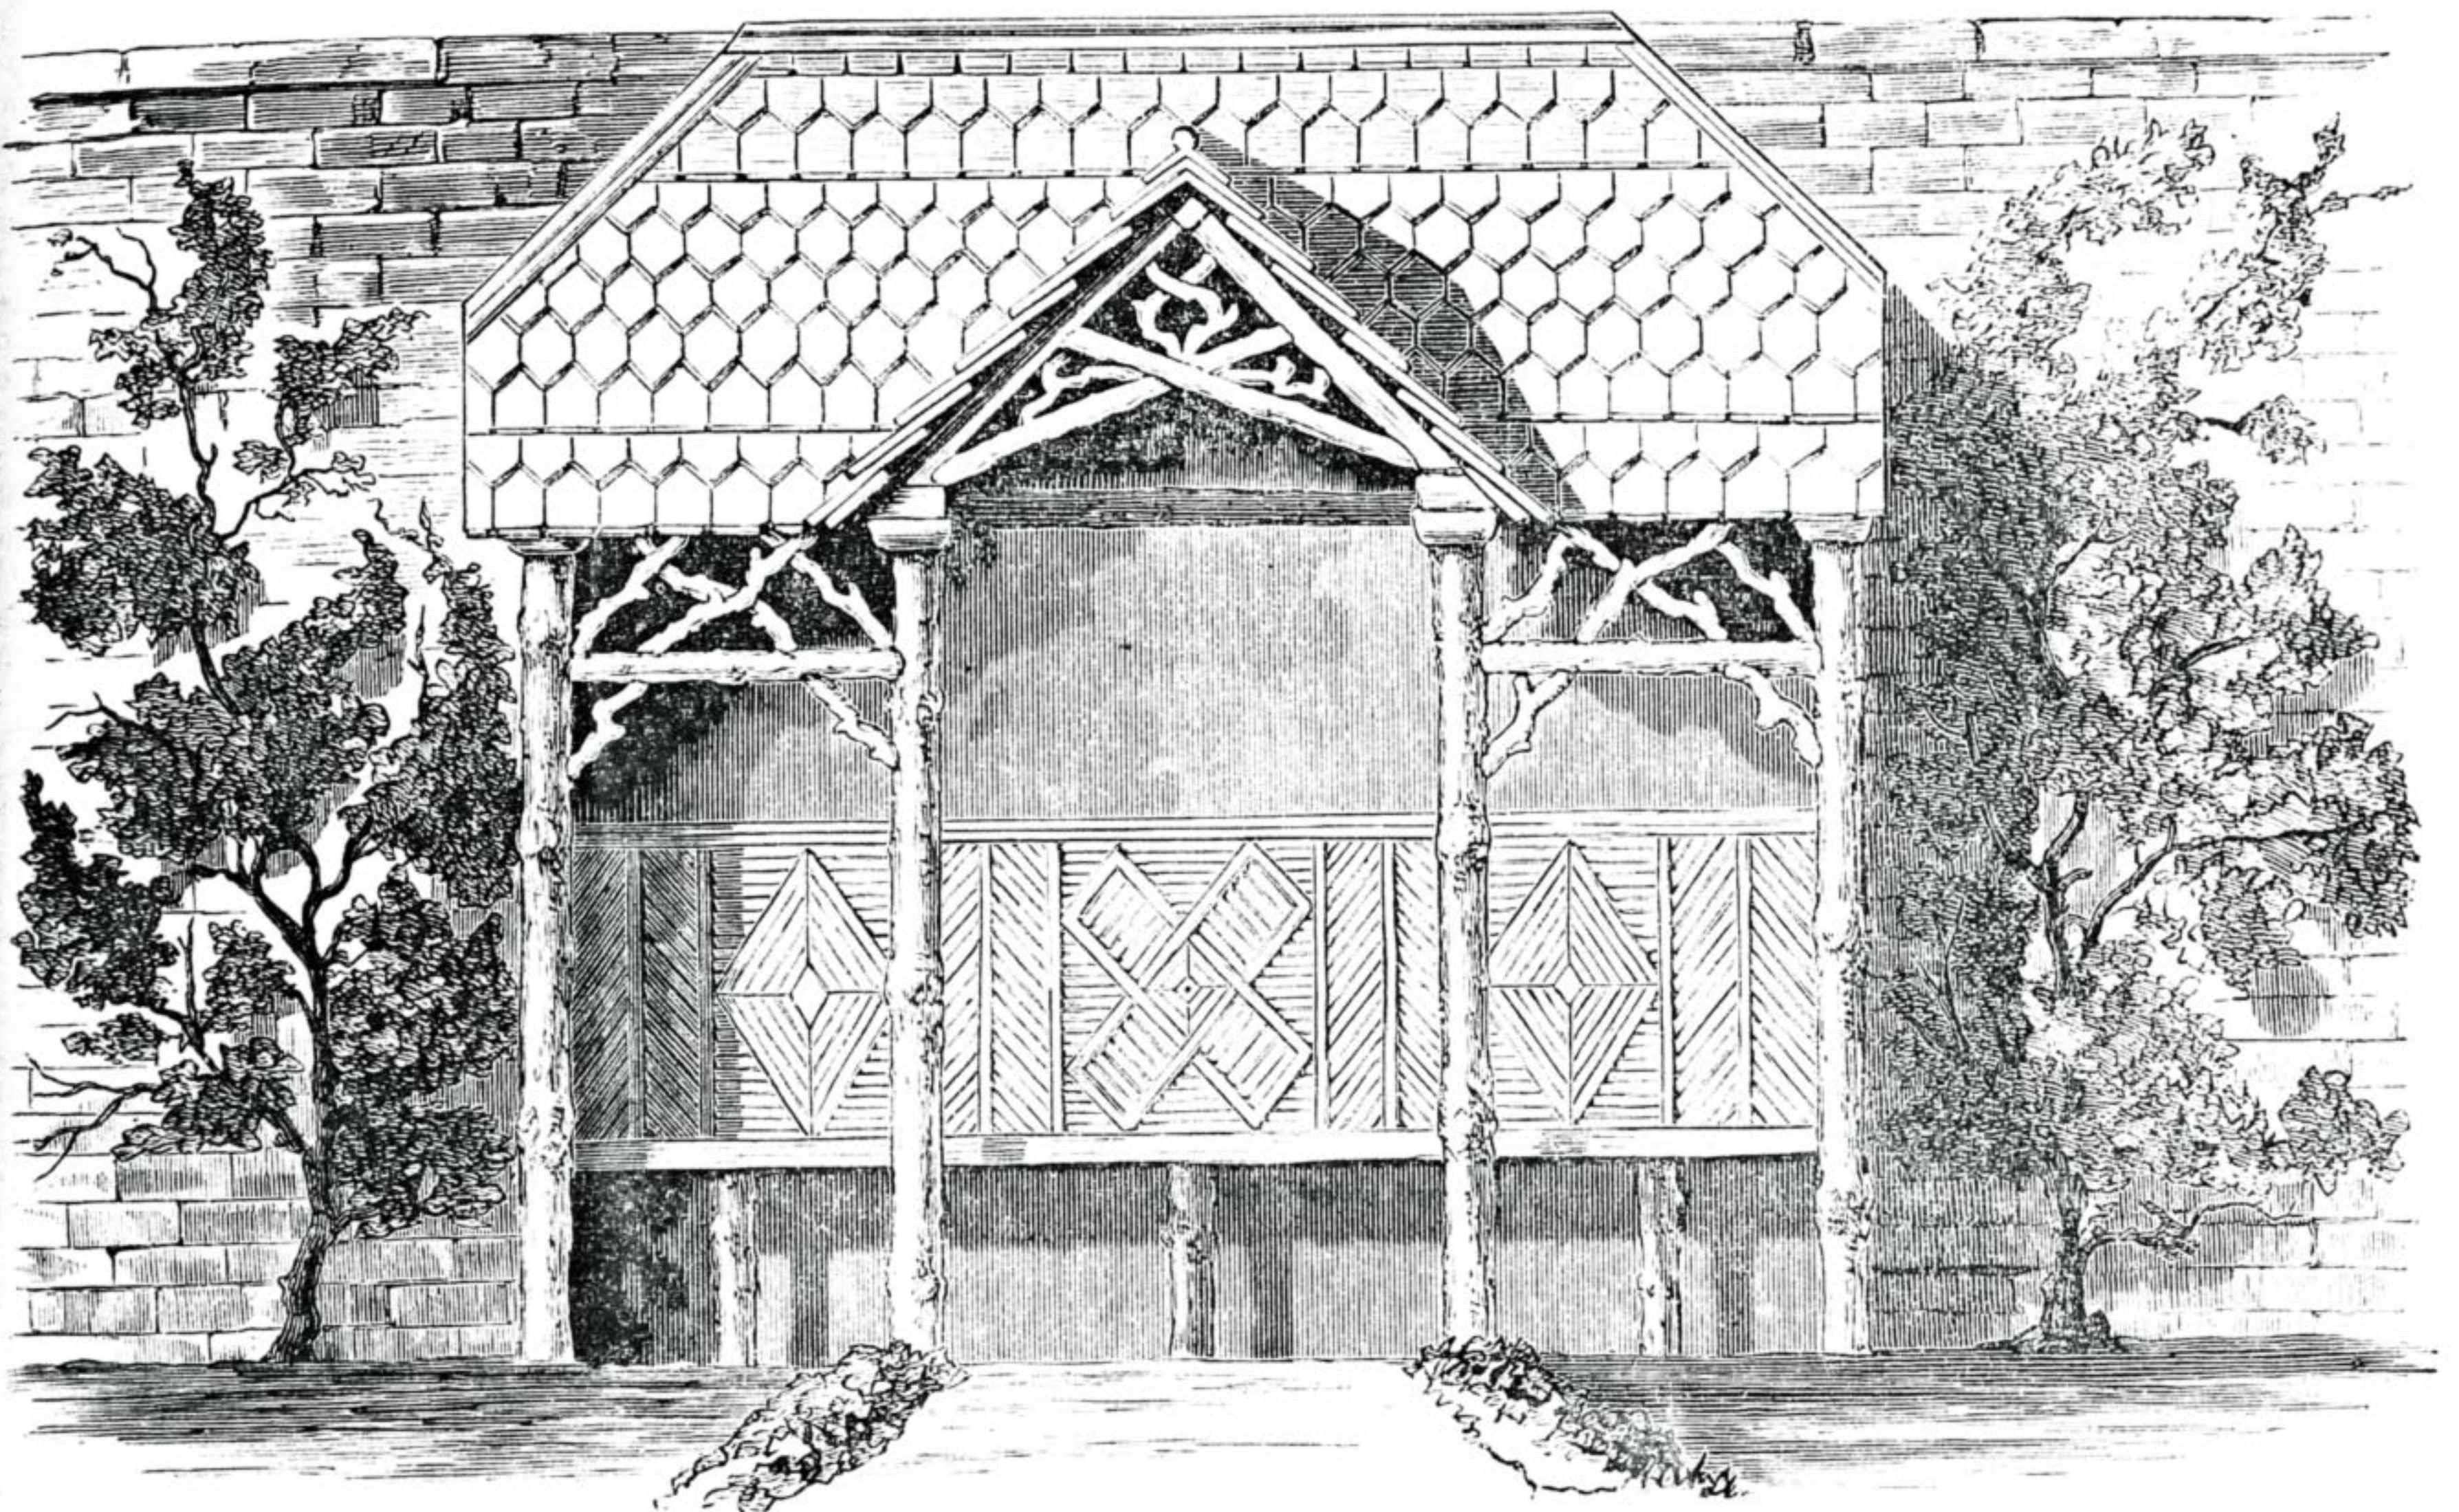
A Lean-to Summer-House for a Small Garden : Front Elevation.
